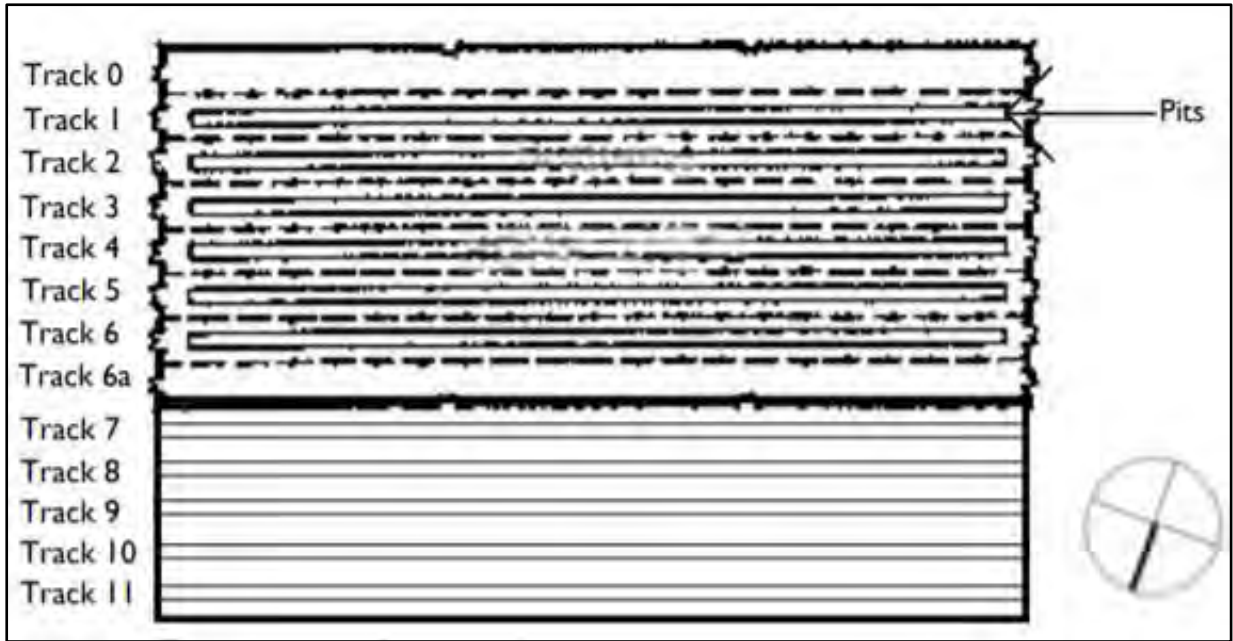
The layout of the Paint Shop showing the position of the tracks/roads and pits. The former Suburban Car Workshops are included from Track 7 to Track 11 on plan. (Source: OCP 2002)
